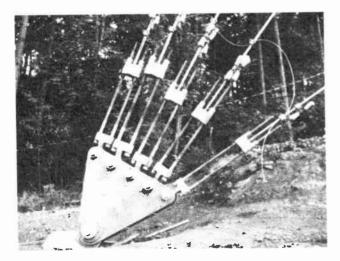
Typical anchor connection with dampers to prevent aeolian vibrations.
